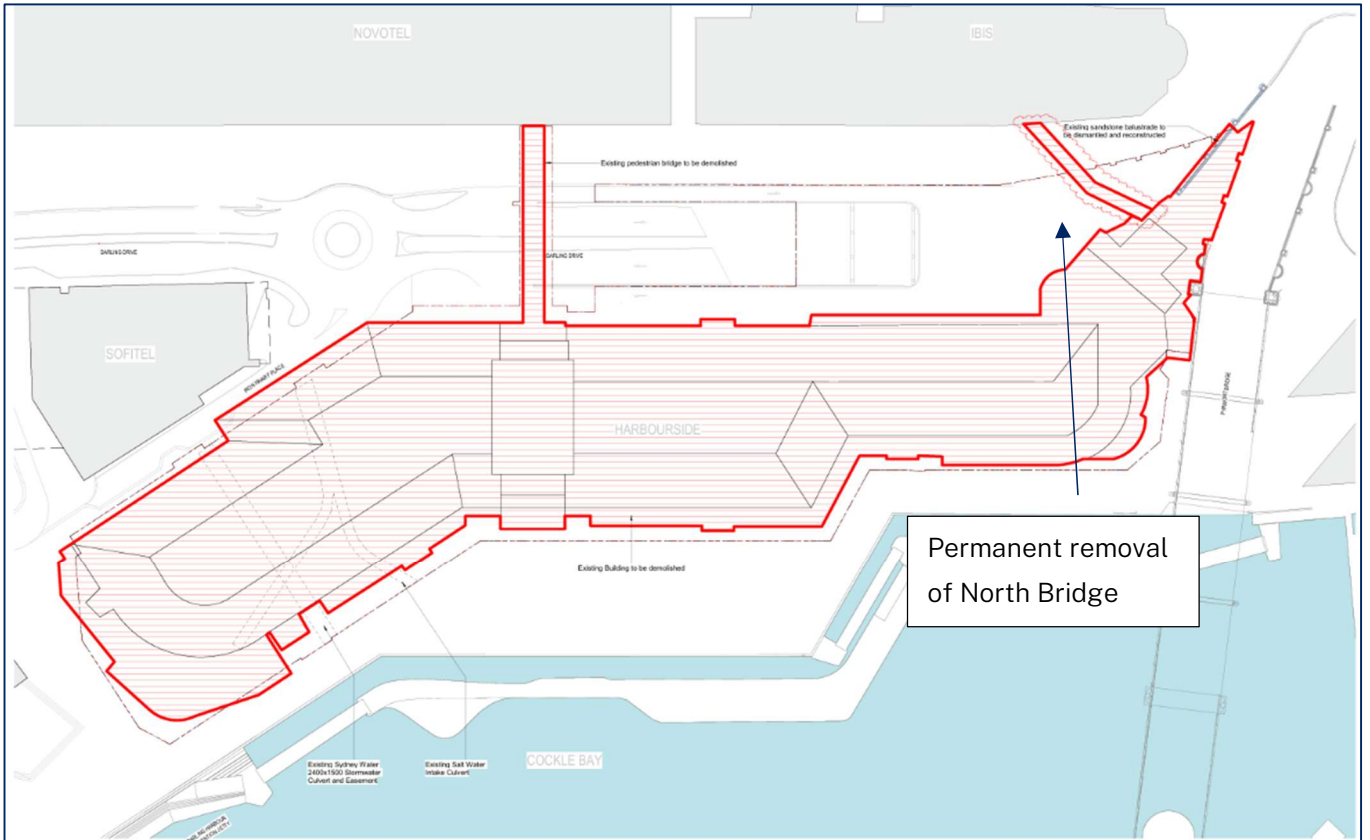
| Proposed demolition plans for SSD-7874-MOD-6 including the demolition of the North Bridge (Source: Applicant’s Demolition Plan)
